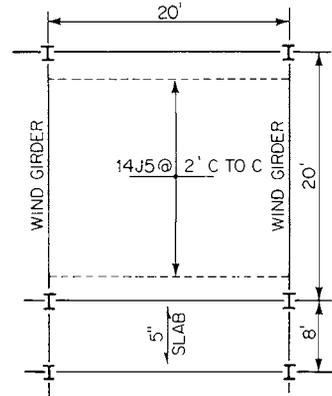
For economical framing, joists are supported on wind girders.
